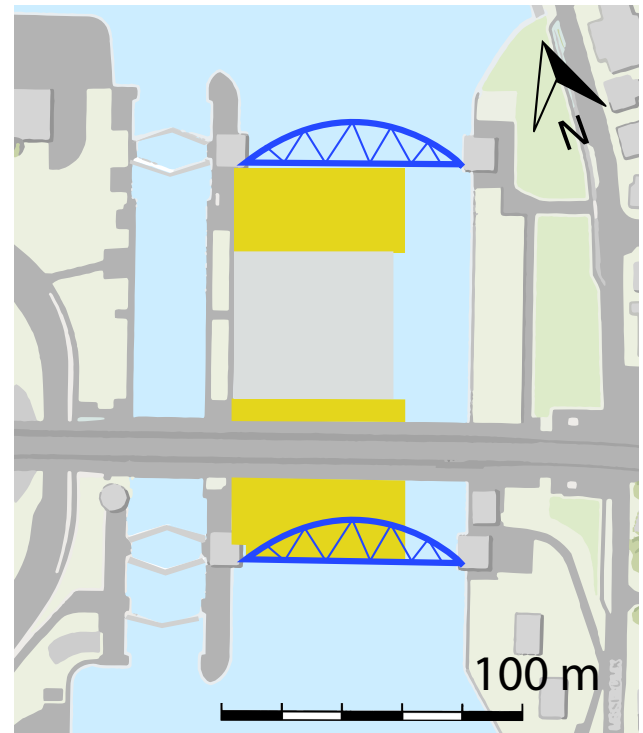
Step 6 & 7: Remove sheetpiles and place scour protection (yellow).
